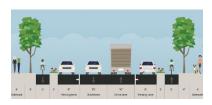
Typical street standard option for new essential streets. Some of the first new developments could make use of public funding to meet street requirements.
